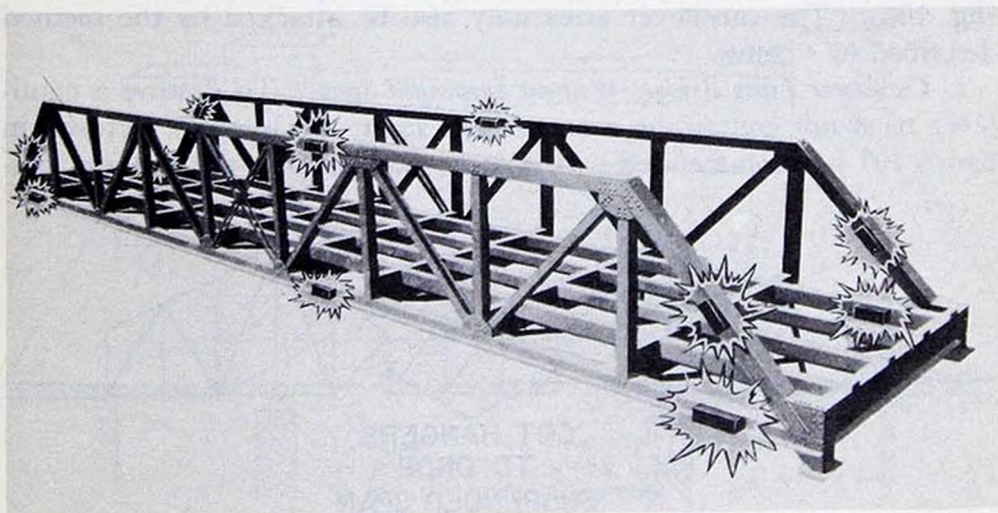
Placement of charges on a steel truss bridge to cut the trusses into segments.
